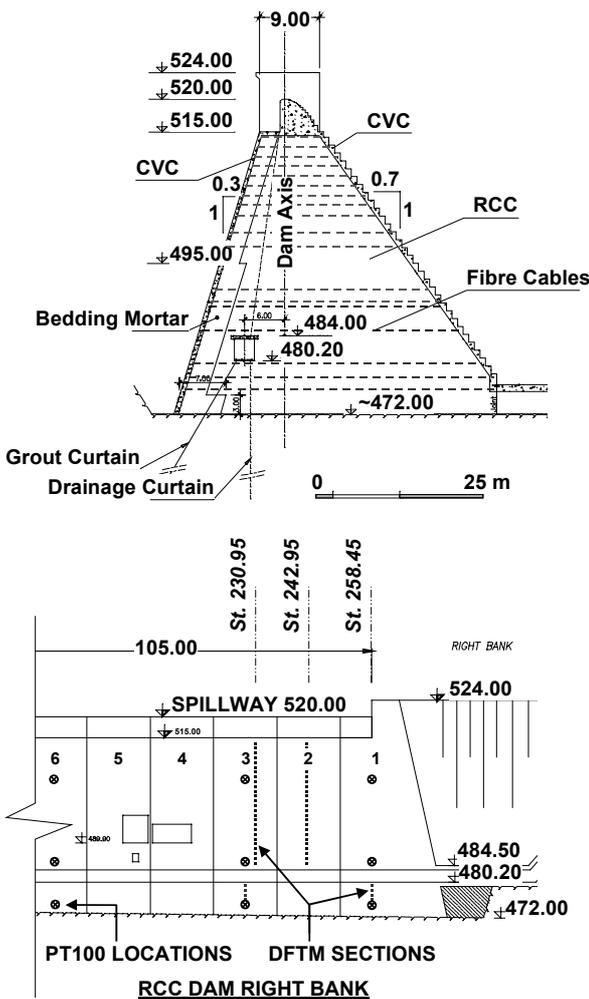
Wala Dam: Cross section and longitudinal section of the right bank
